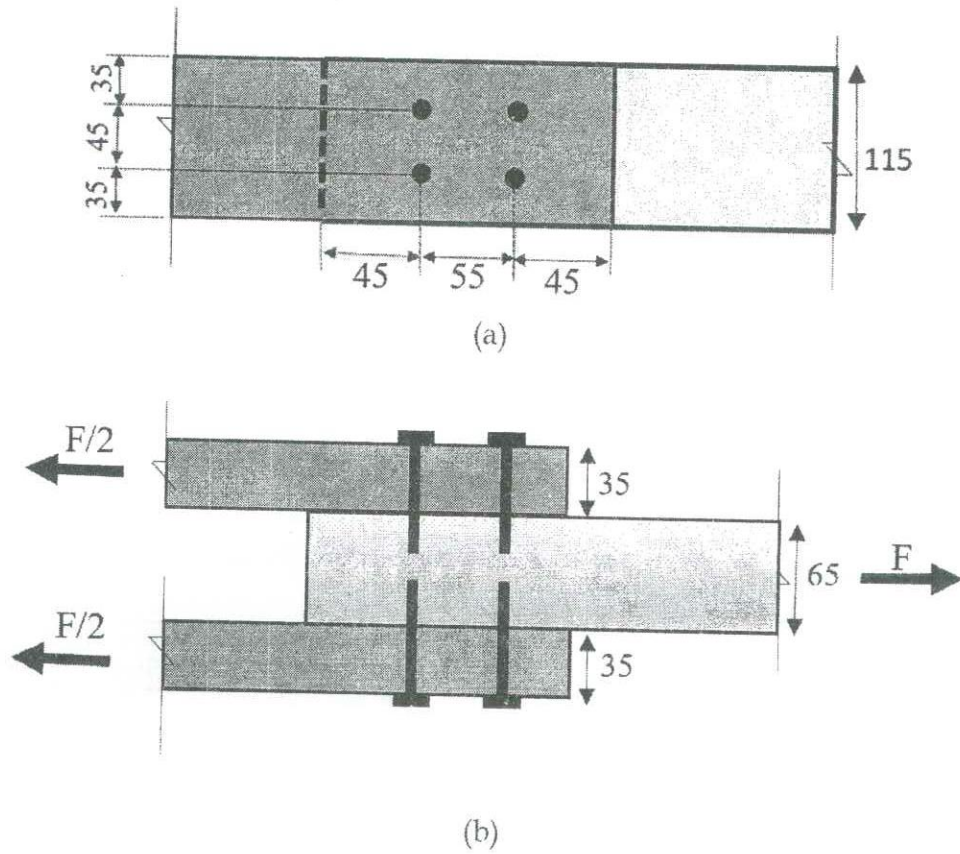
(a) Plan and (b) Elevation view of the timber-to-timer connection (all dimensions are in mm).
